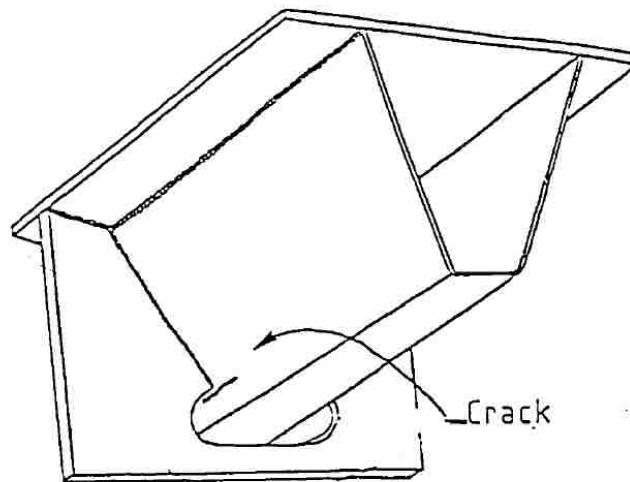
Fatigue crack at extended cutout termination in the rib wall (reproduced from Dexter and Fisher 1997)
